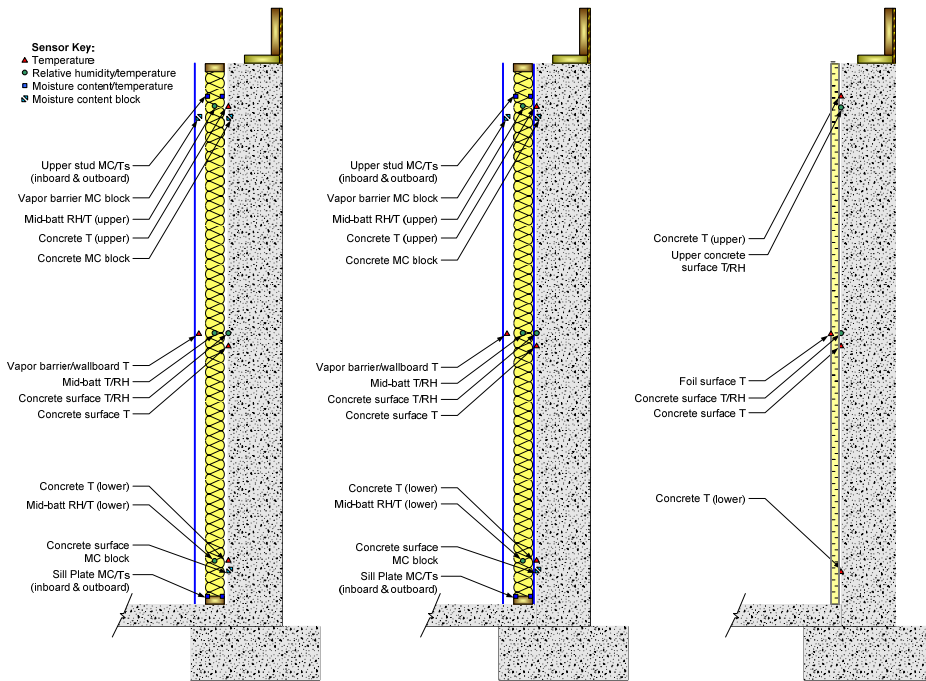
Section and sensor layout for Huntley site walls 1, 2, and 3
